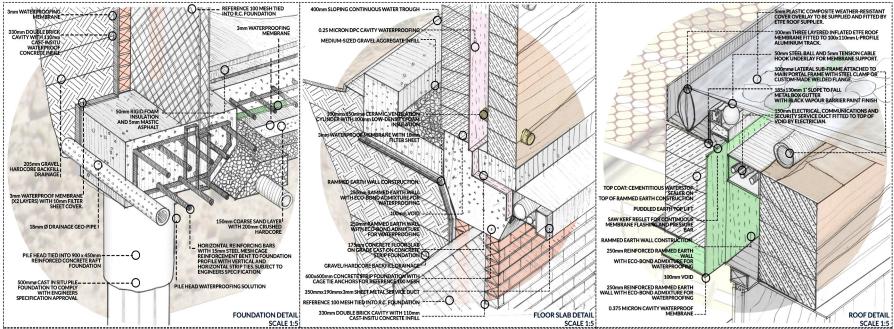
Technical iteration 04 - Foundation, Floor and Roof connection details. Author, 2016.
